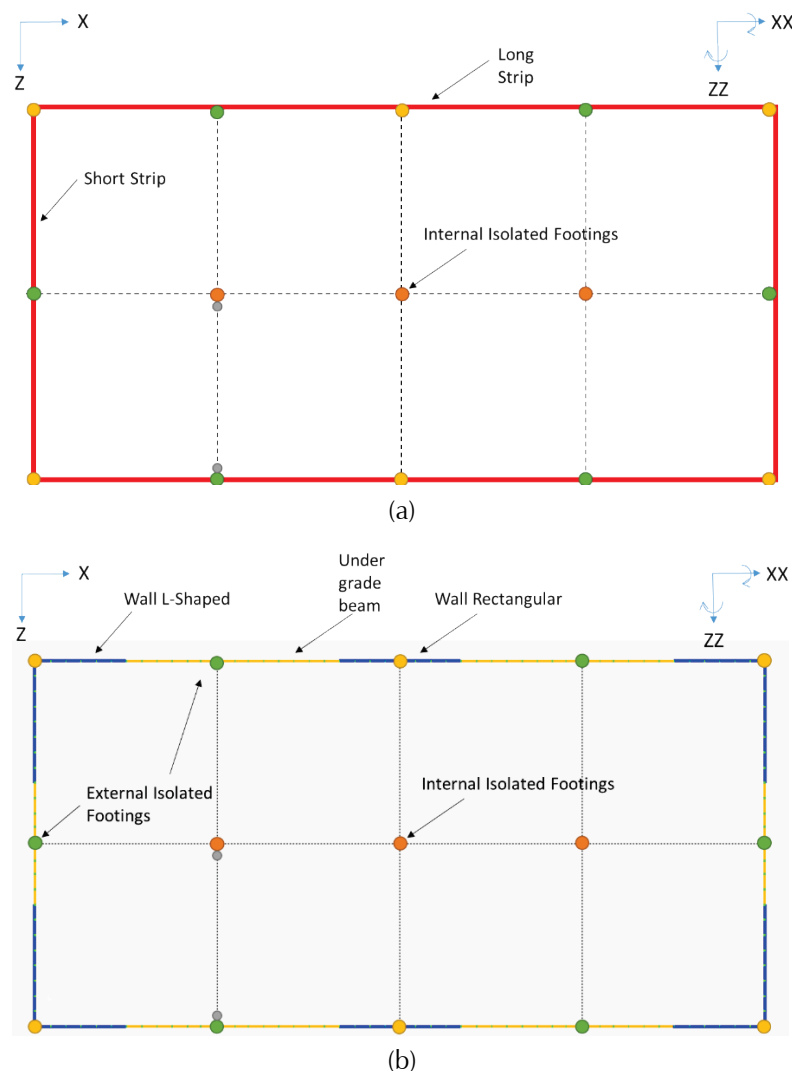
Layout of COM2B modeled footings for SSI study: (a) soft site and (b) stiff site.
